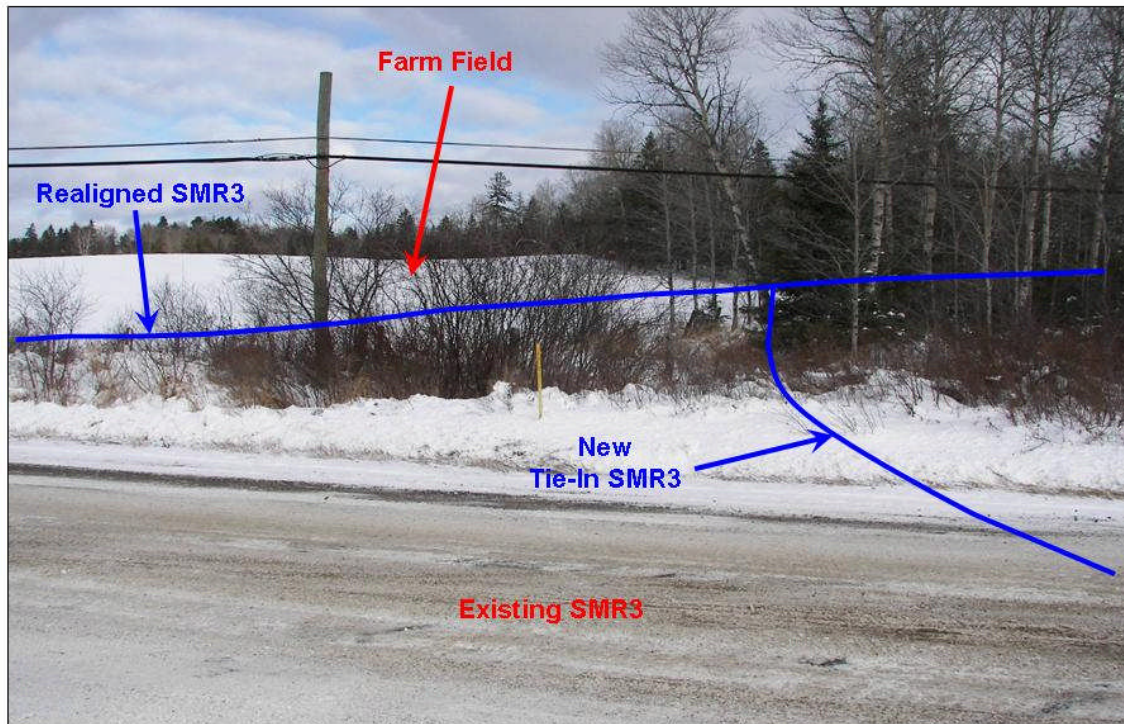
VIEW: Looking west from north shoulder of Lockerby Mine Road about 500 m east of existing SMR3. View of site for realigned SMR3, E-N/S and S-W ramp sections north of future SMR55 / SMR3 underpass. (Dec. 6, 2007)
